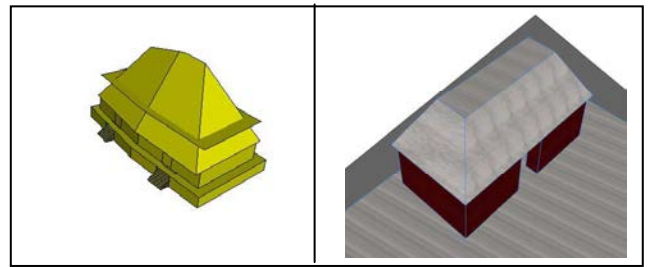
unsuccessful attempt to modify hip roof with trim plane (left); successful sloped roof using split surface and component index (right)
